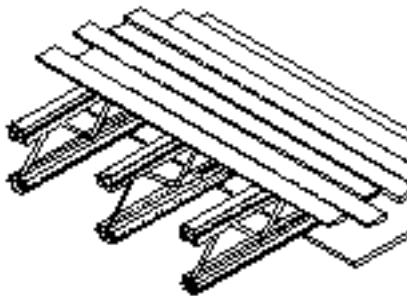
A fabricated steel joisted floor. Although the joists in these floors were not always galvanised, significant corrosion in ungalvanised units has been rare
